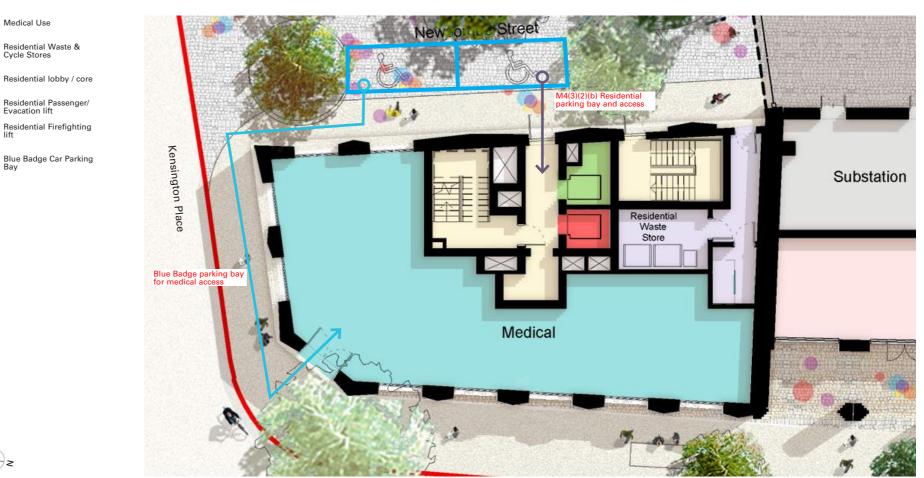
Illustrative Proposed Ground Floor to the Affordable Block and access to Blue Badge Parking Bays
